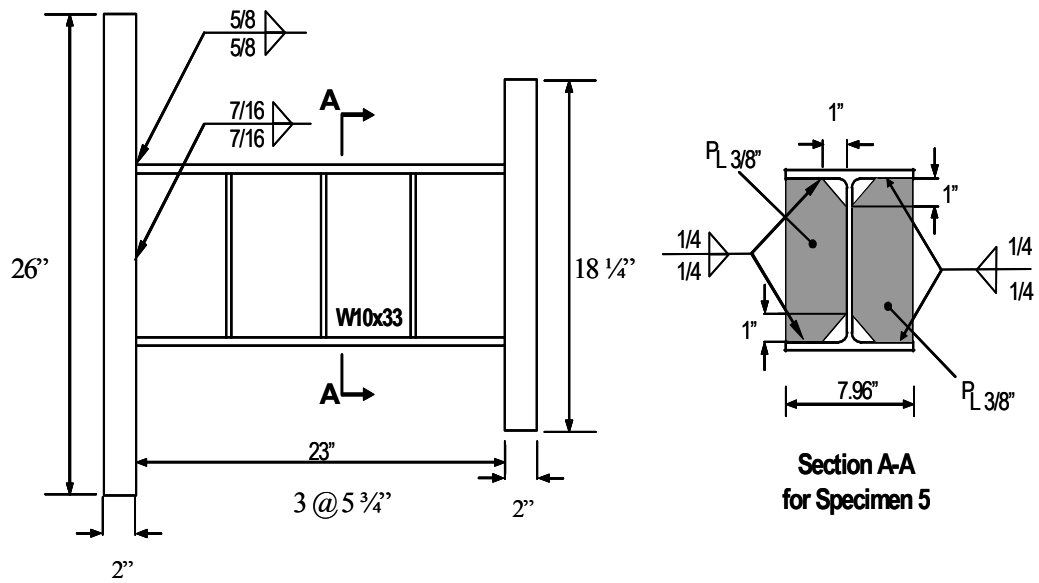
Welding and stiffeners details for Specimen 5
